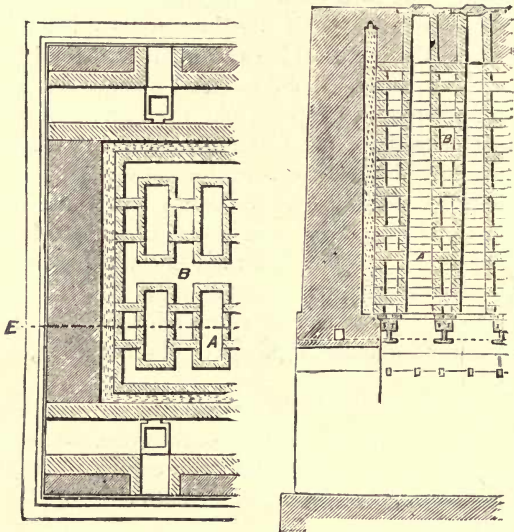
Plan and Longitudinal Section of Appolt Oven.
